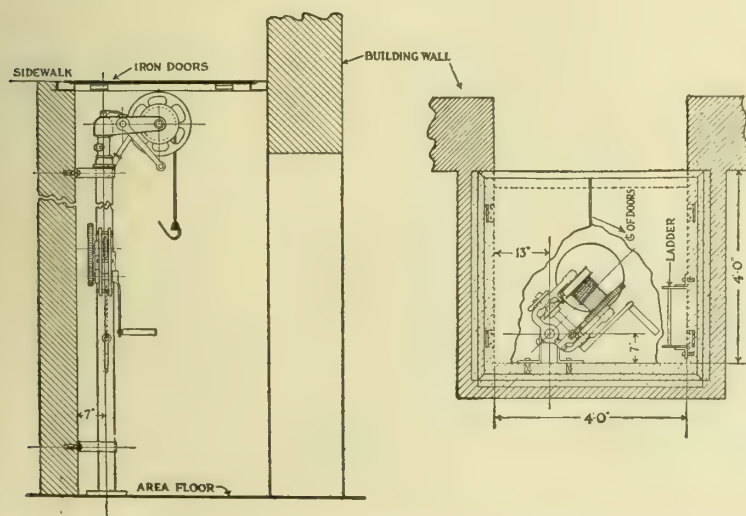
ELEVATION AND PLAN SHOWING ARRANGEMENT OF G & G TELESCOPIC HOIST, MODEL A, IN AREA OF USUAL SIZE
